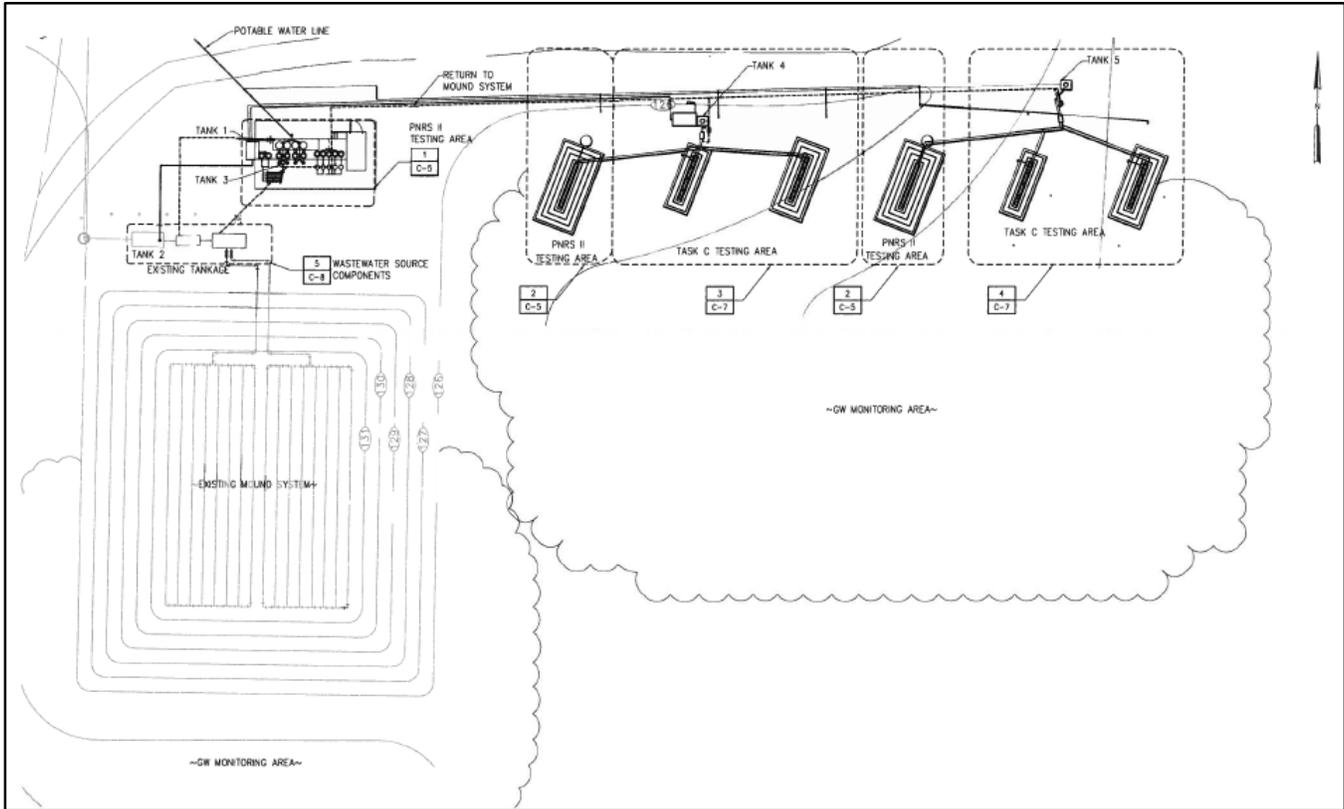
Site Plan of the Groundwater Monitoring Area at the Test Facility
